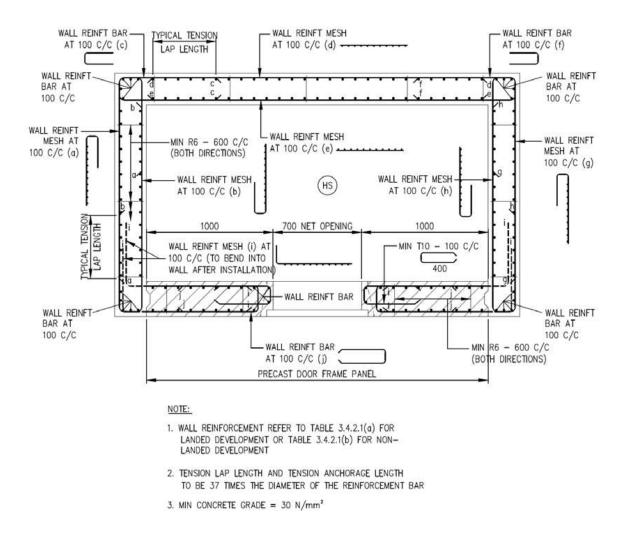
PLAN OF PRECAST HS, SS or SSS DOOR FRAME (TYPE 3)
